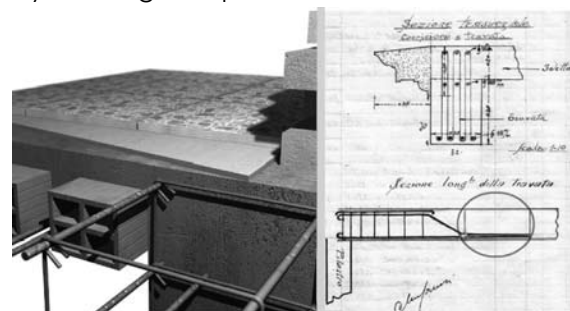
The reinforced concrete and hollow tiles mixed first floor.
